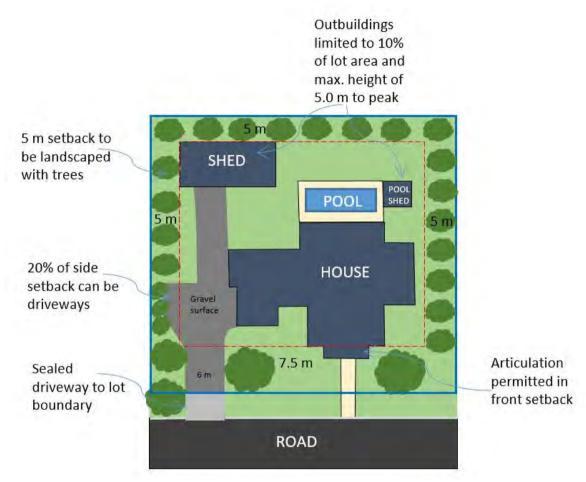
INDICATIVE SITE PLAN AND CONTROLS FOR LARGE LOT RESIDENTIAL
